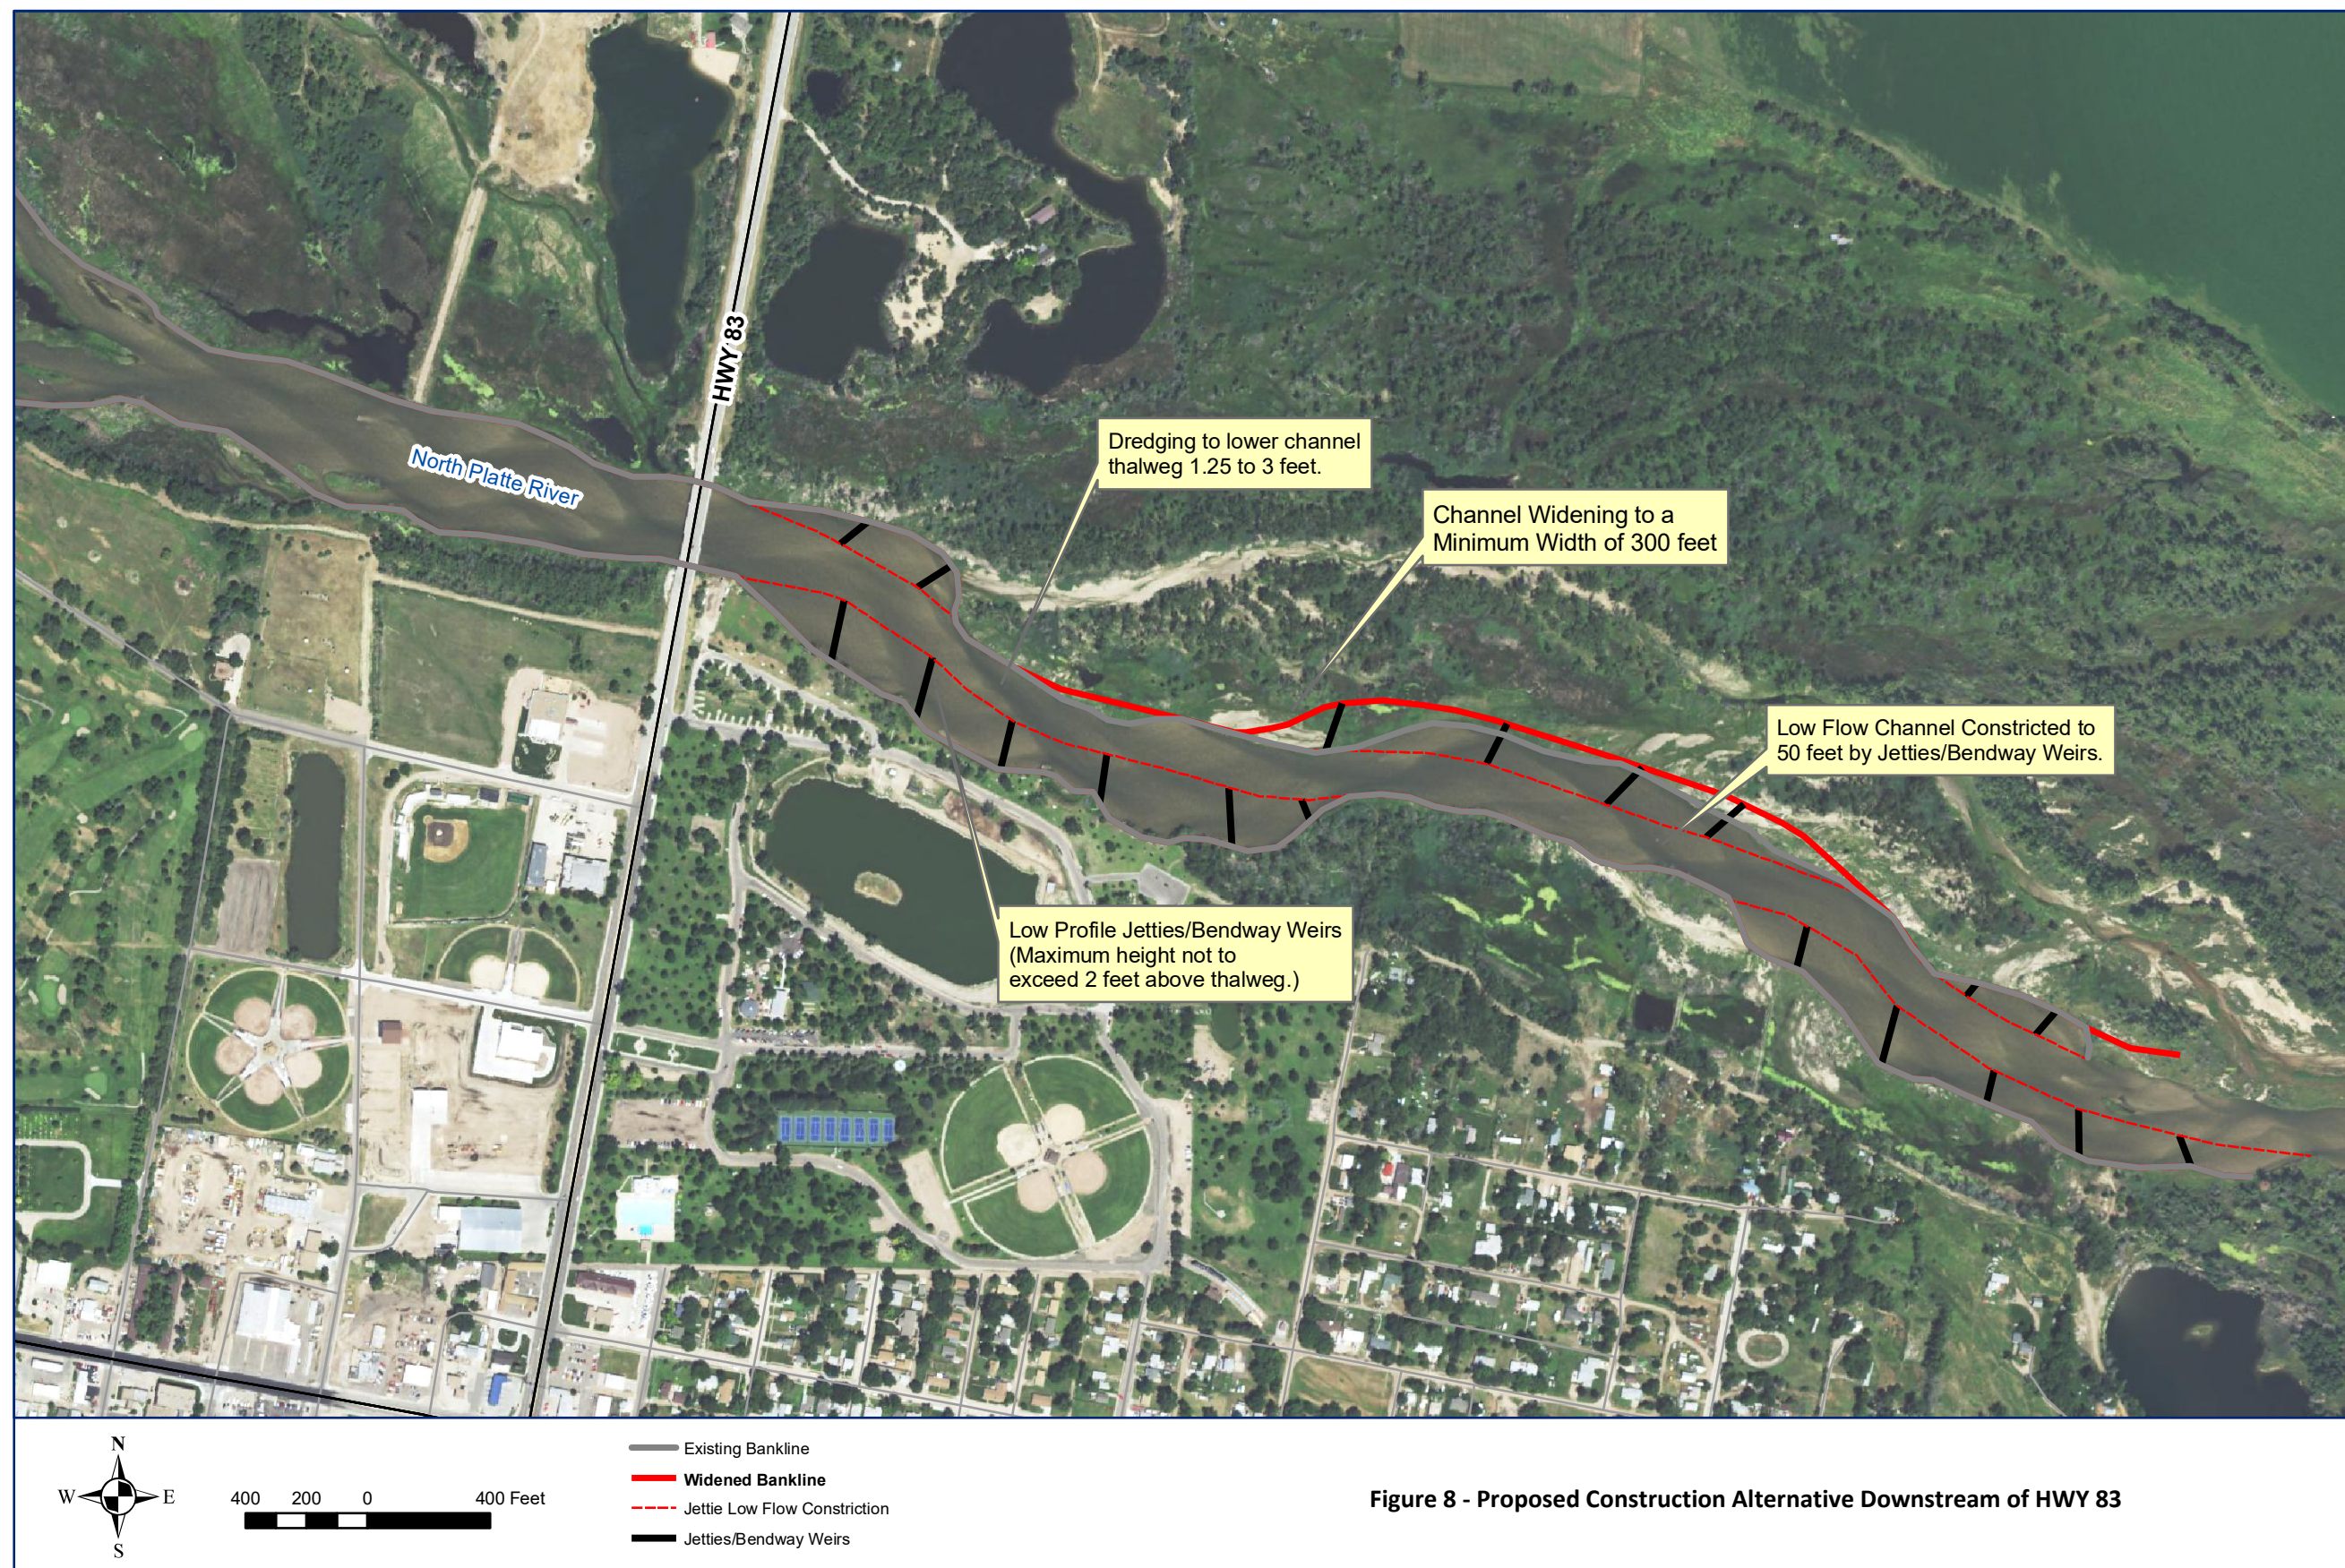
Proposed Construction Alternative Downstream of HWY 83
